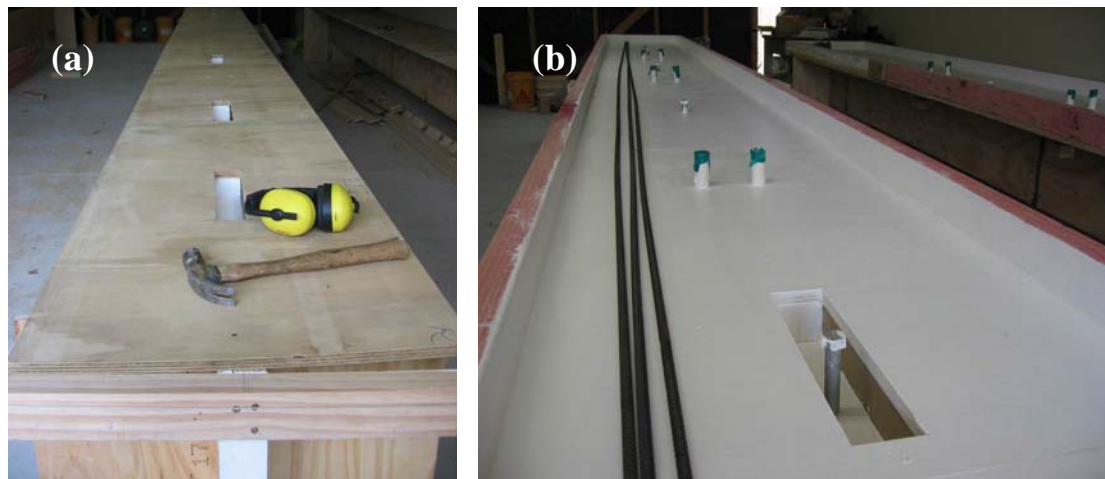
(a) Construction of formwork for single LVL TCC 600 mm flange; (b) formwork ready with a coat of acrylic white paint and 300 mm rectangular notched with coach screw
